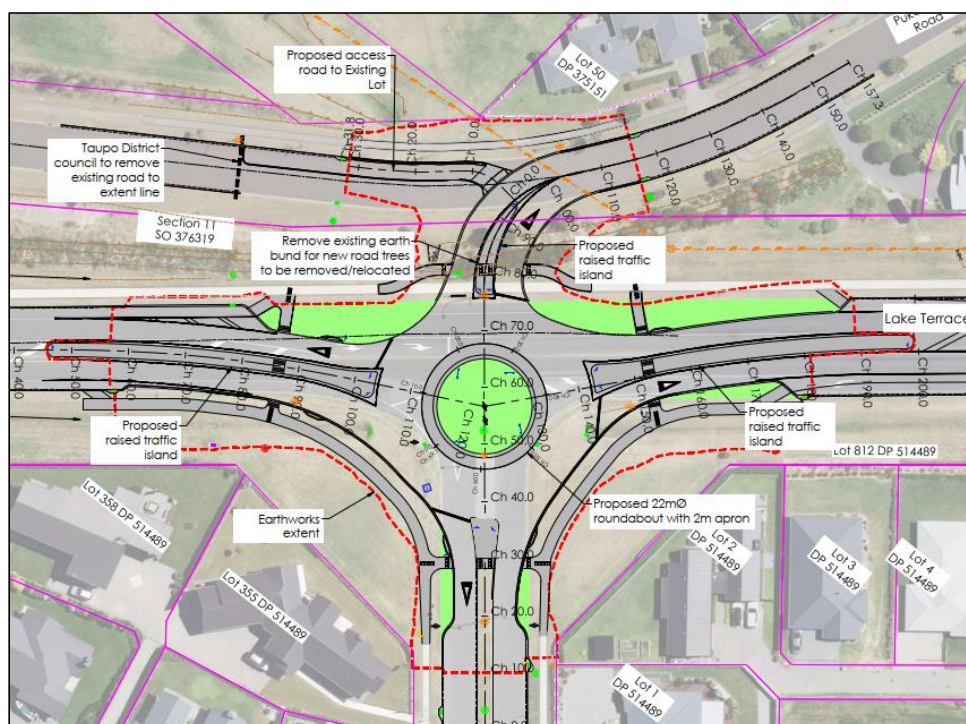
Concept layout of 4-leg option for Maunganamu Drive roundabout
